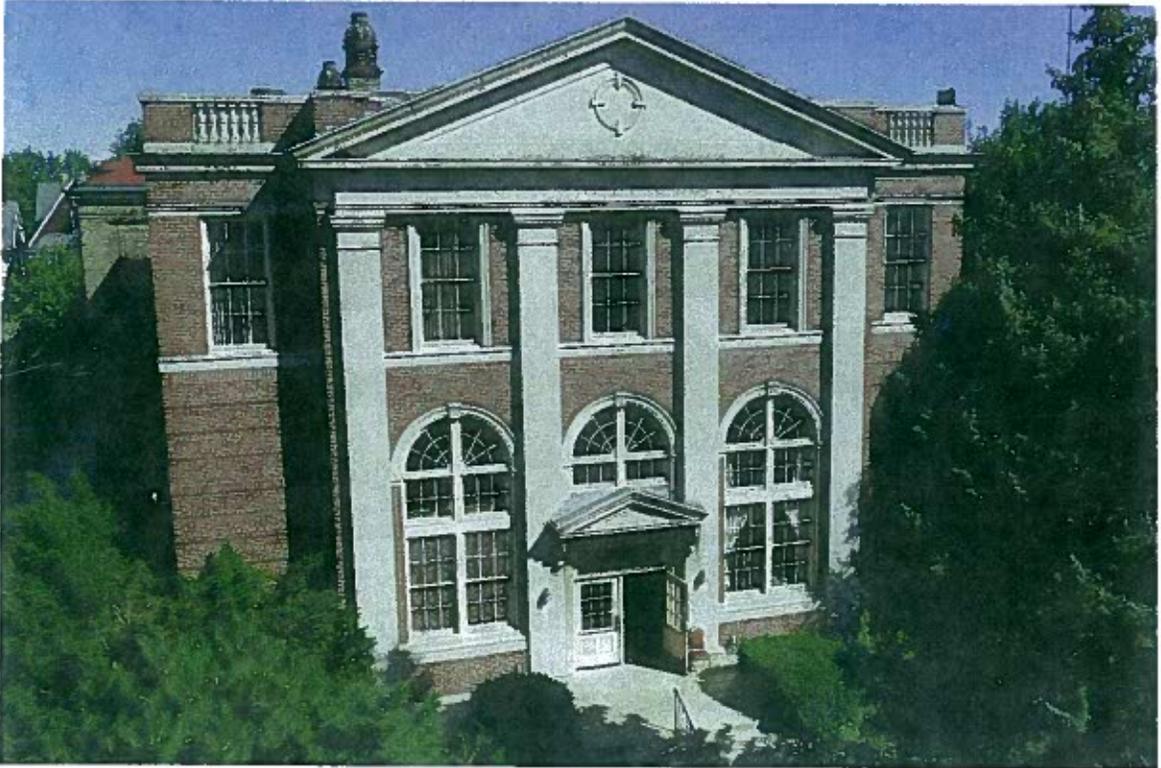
View from roof of Gymnasium/Rec Center. Wood door to be refurbished. Spalling at entry steps and crack at base of right column. Moisture infiltration through the parapet has caused spalling of the limestone details at the pediment and balustrade as well as mortar decomposition.
